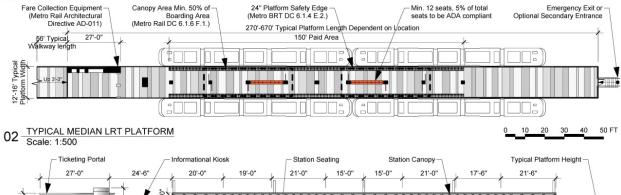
and Figure 4-8 illustrate a typical station with a canopy that would be constructed under Build Alternative 4.
